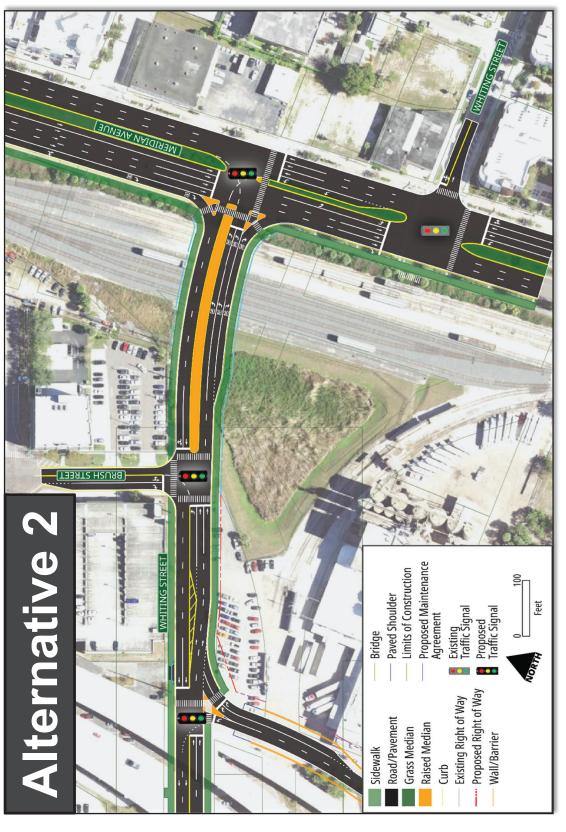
Alternative 2 – Whiting Street from North Brush Street to North Meridian Avenue
